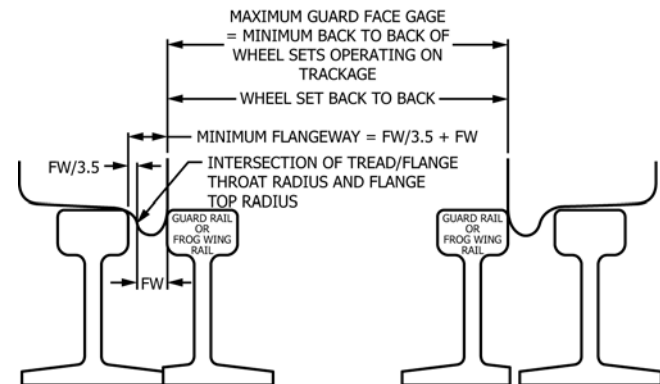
Maximum Guard Face Check Gauge in Turnouts and Rail Crossings
